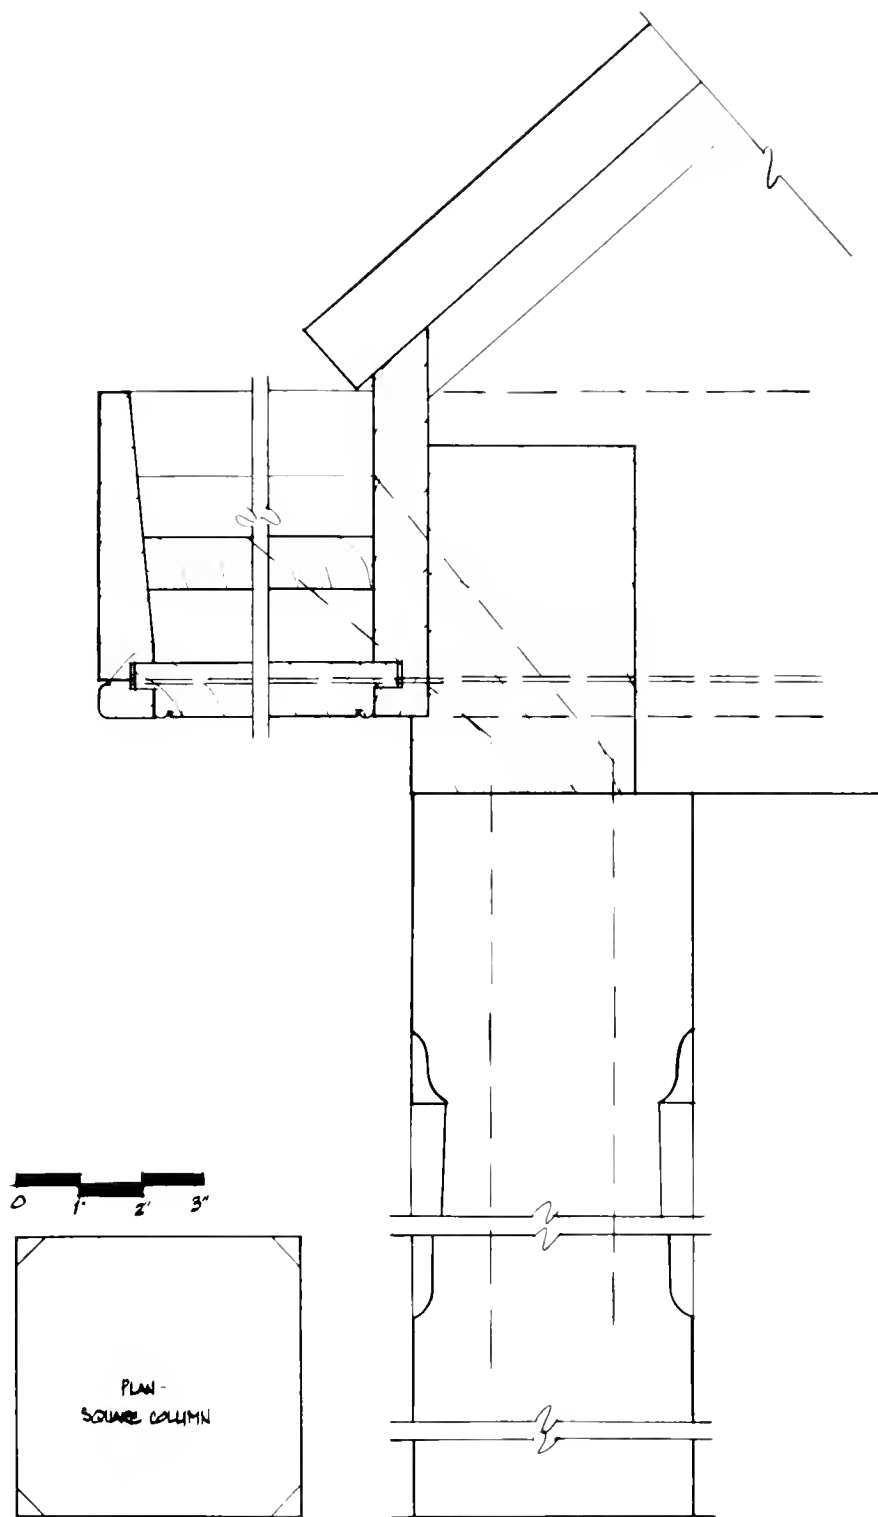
East Porch box gutter detail. The hipped roof sheds rain water into the sloping trough and directs it towards the hollowed square column which acts as a downspout (Drawings surveyed and adapted from Okie prints).
